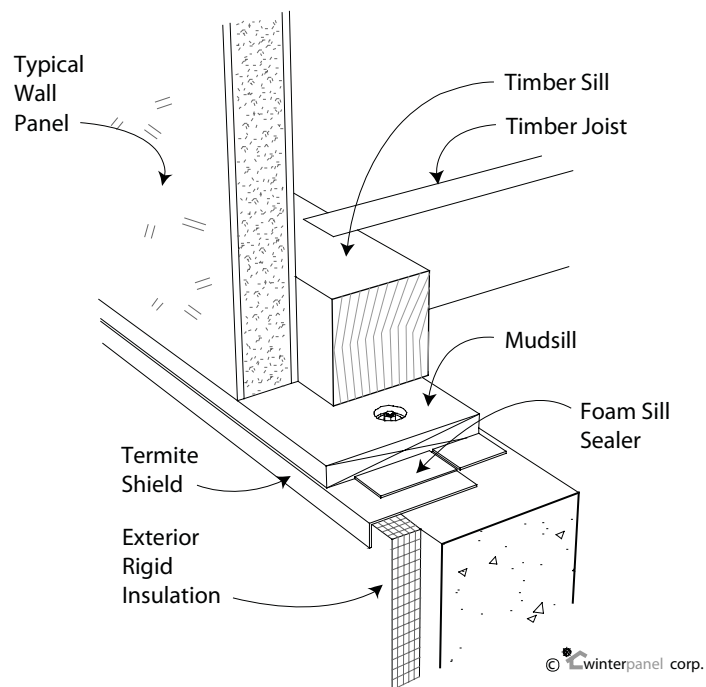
Panel Attachment at Sill. This detail varies with building design—it must be worked out at the design stage. In general, the outer panel surface should be flush with the outside of the finished frost wall (with or without exterior insulation).
